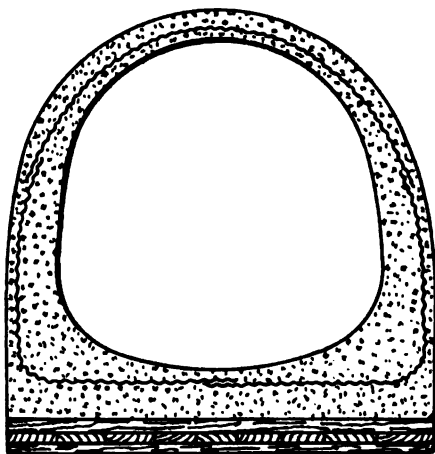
Section of Sewer Built of Armoured Concrete.
